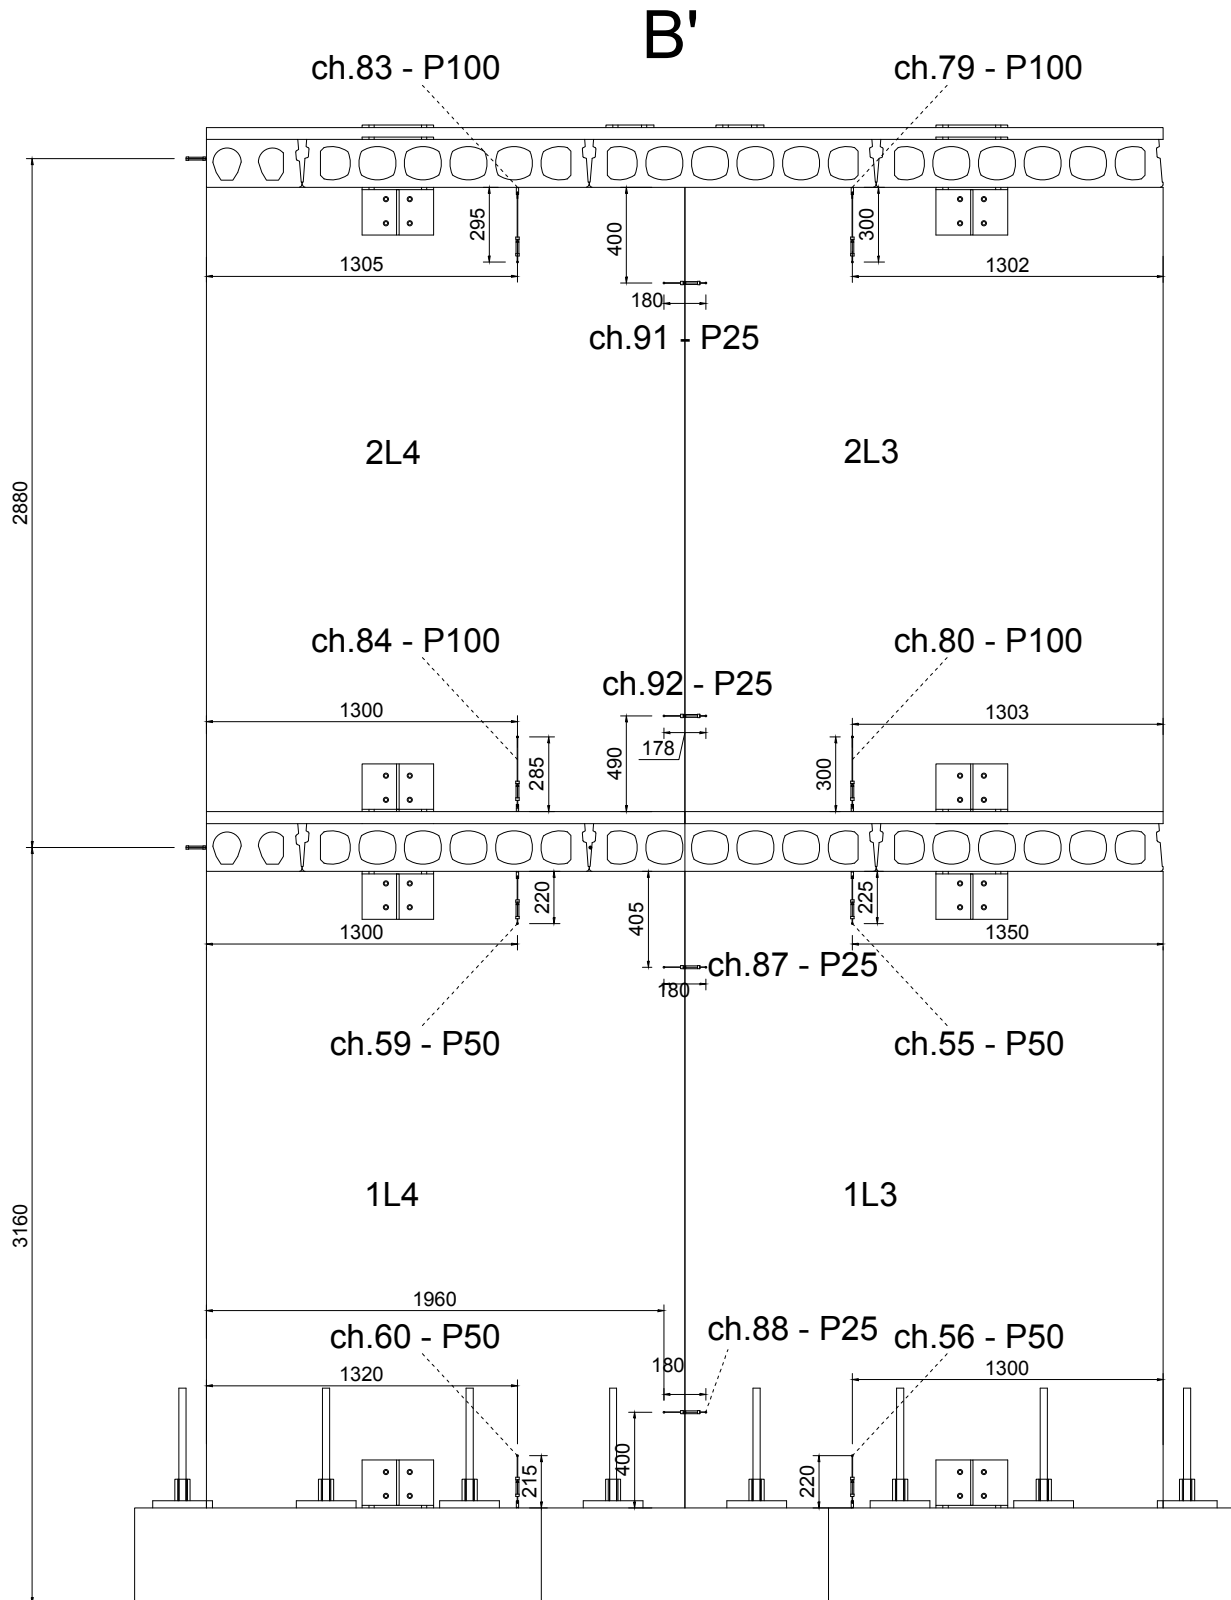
Schematic of the installed instrumentation: front views of the specimen – Lateral walls, B'.
